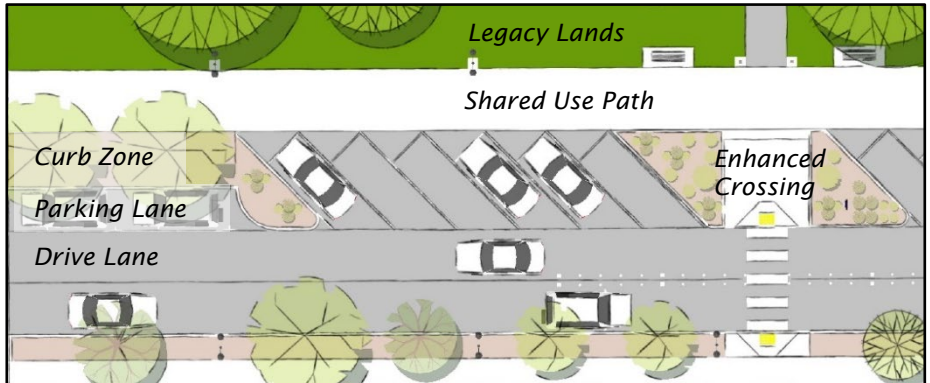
Collector Street Right-of-Way (60' ROW min.)
